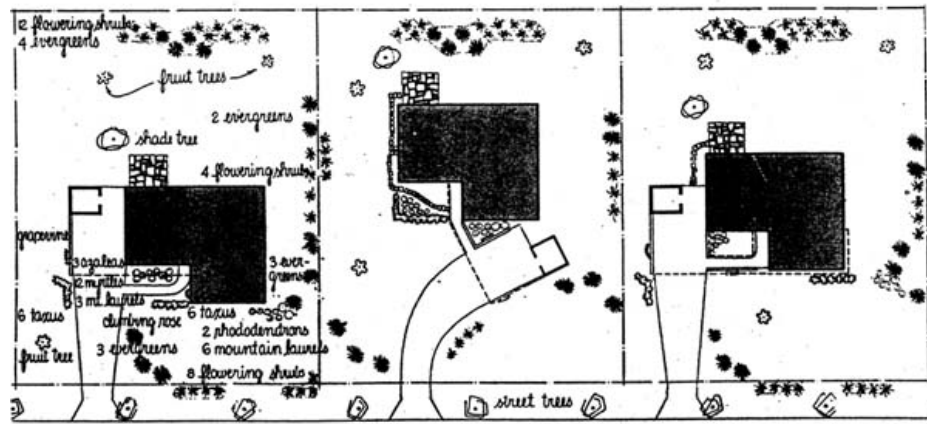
landscape plan for a Levittowner house (www.llewellynpark.org)
